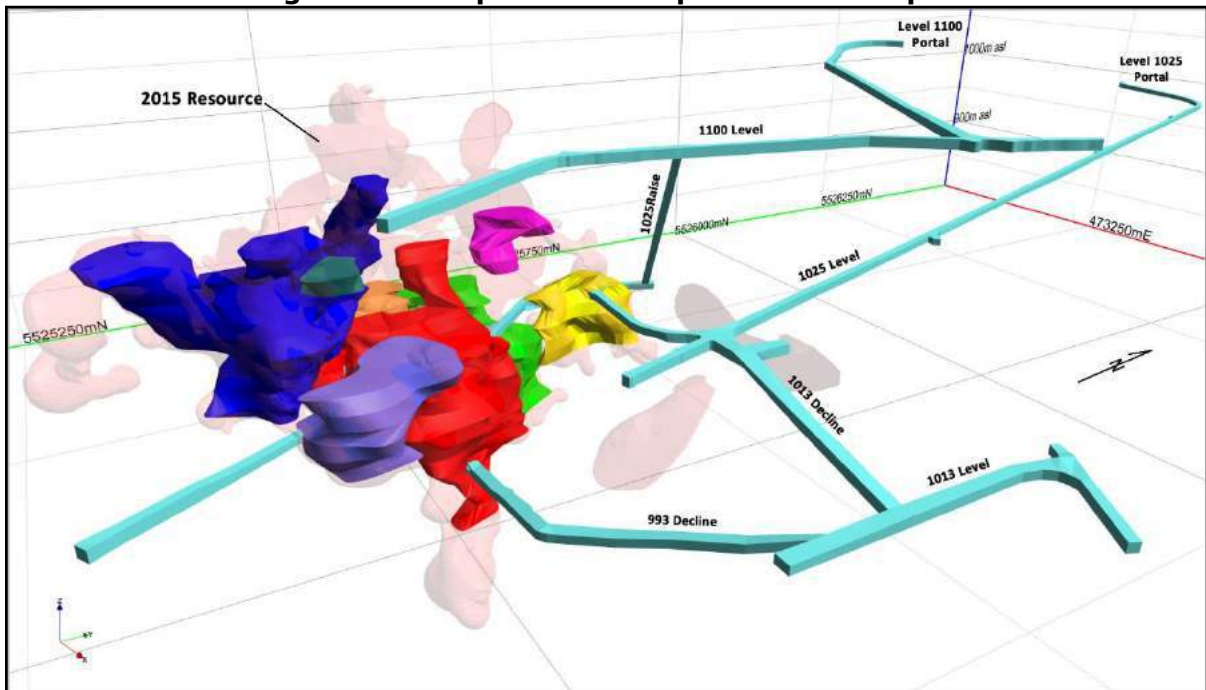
Proposed Development – All Stopes, Looking NE
